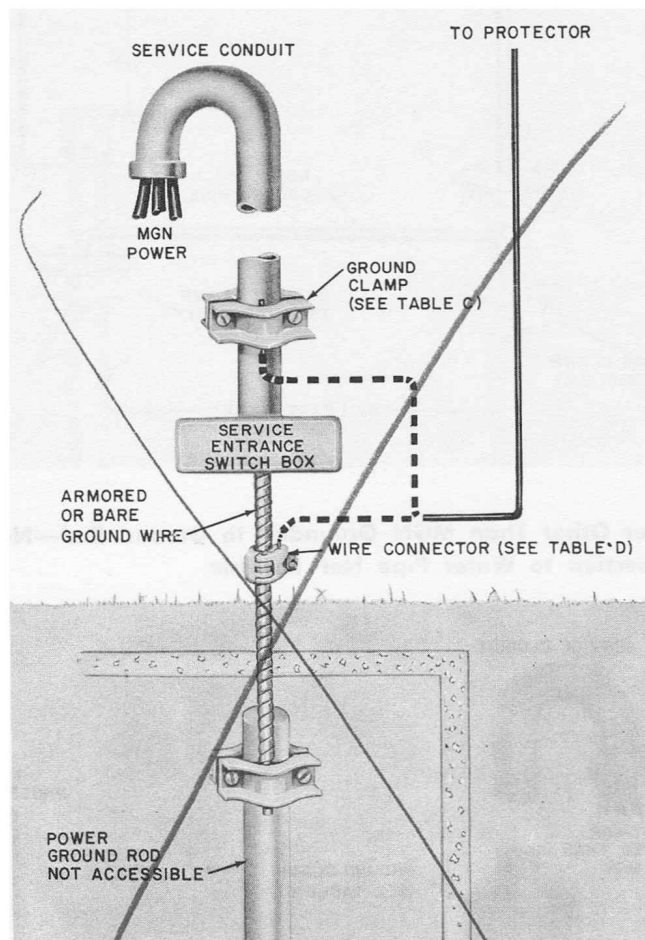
MGN Power Grounded to Inaccessible Ground Rod—No Water Pipe—Connection to Pipe Not Possible
